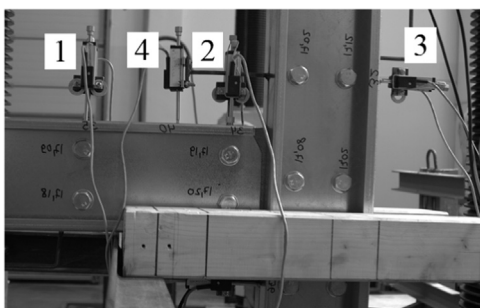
Transducers for the measurement of rotations: 1,2 – beam bolt group; 3 – column bolt group; 4 – gusset plate.
